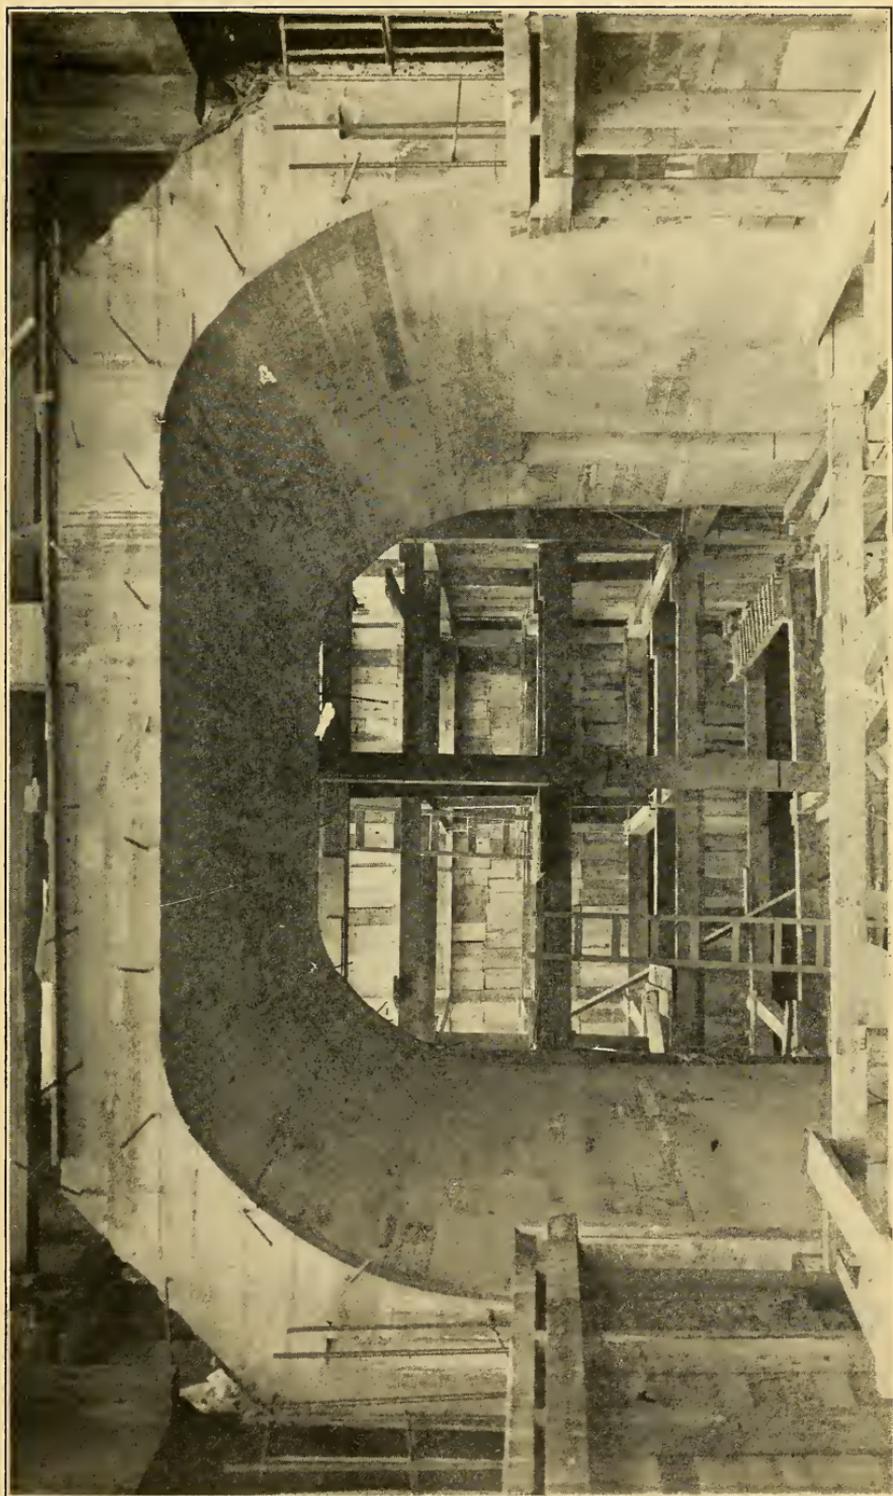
TYPICAL SUBWAY SECTION — MAVERICK SQUARE
